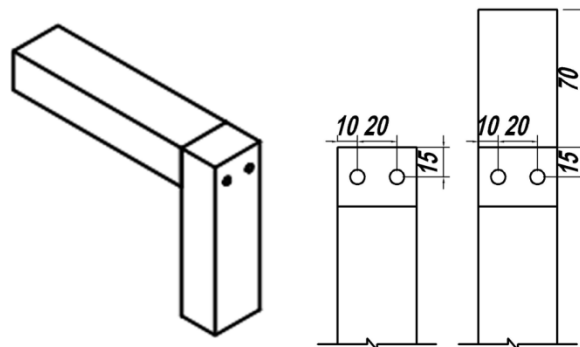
The connection form and the guide hole position of the BFPC component. Measurements are given in mm.
